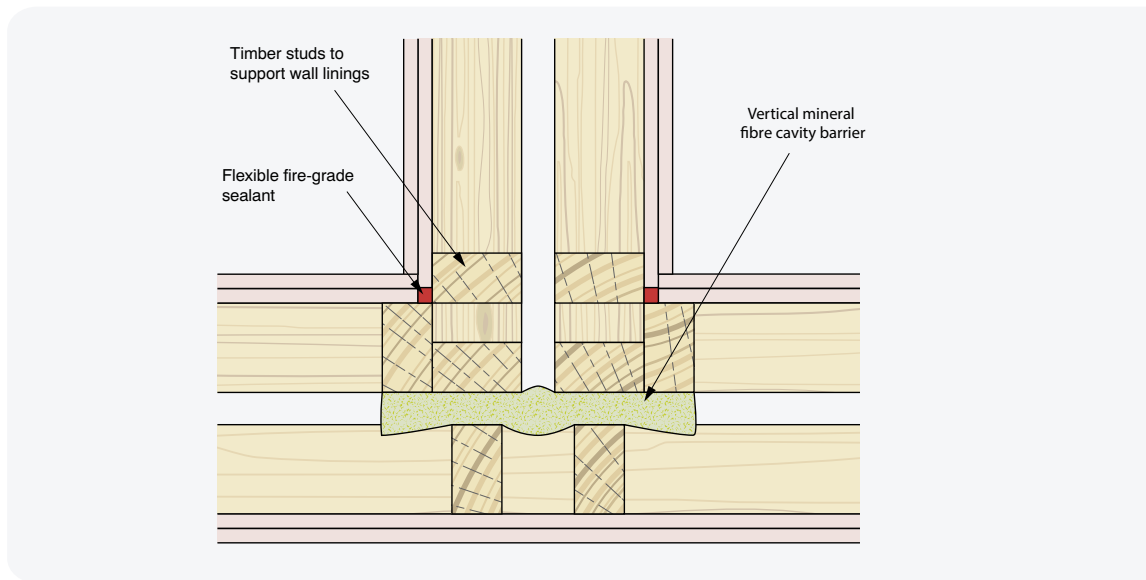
Double stud fire-protected timber internal wall intersection.
